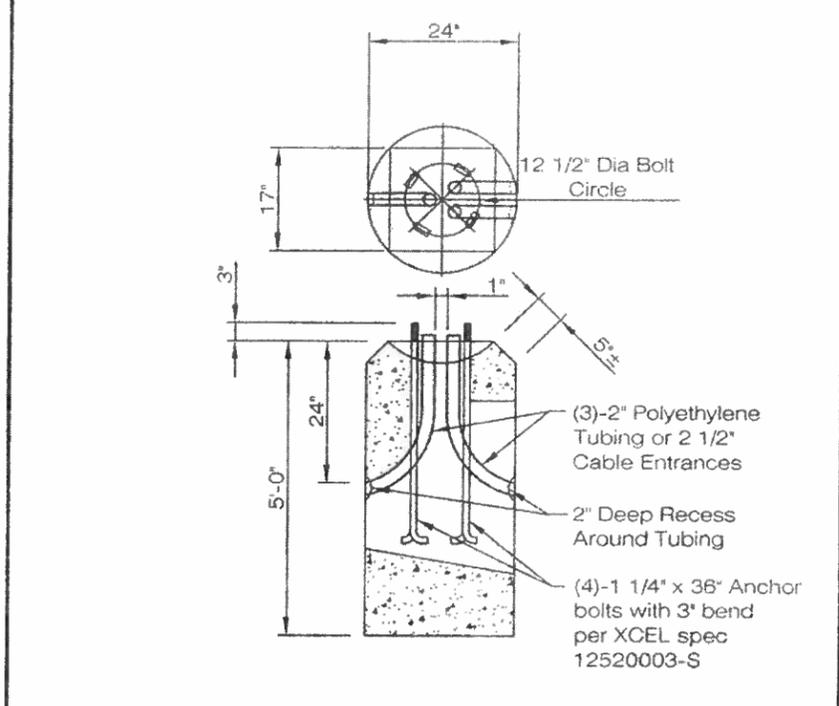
STREET LIGHT FOUNDATION - PRECAST CONCRETE DESIGN 5
